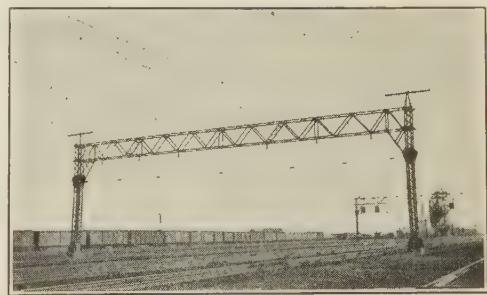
TYPICAL 6-TRACK CONSTRUCTION
